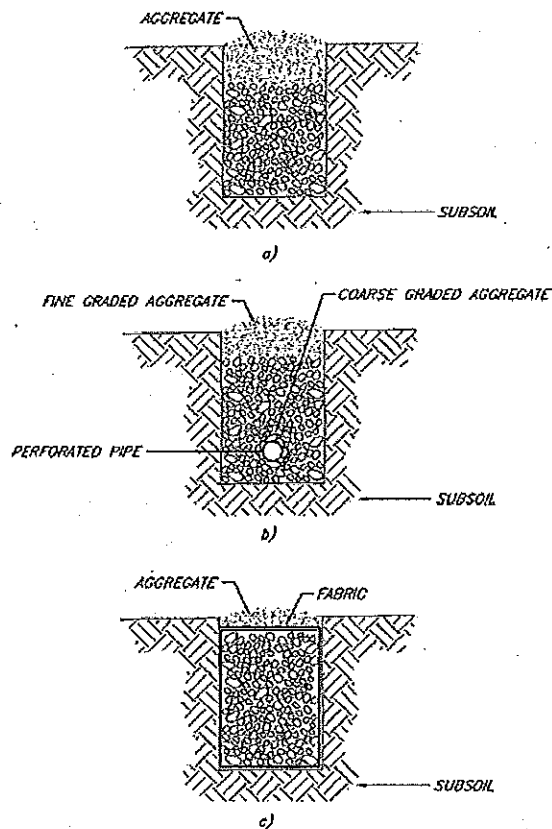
Cross sections of subsurface drains. a) French drain, b) conventional trench drain with pipe, c) trench drain with filter fabric.
